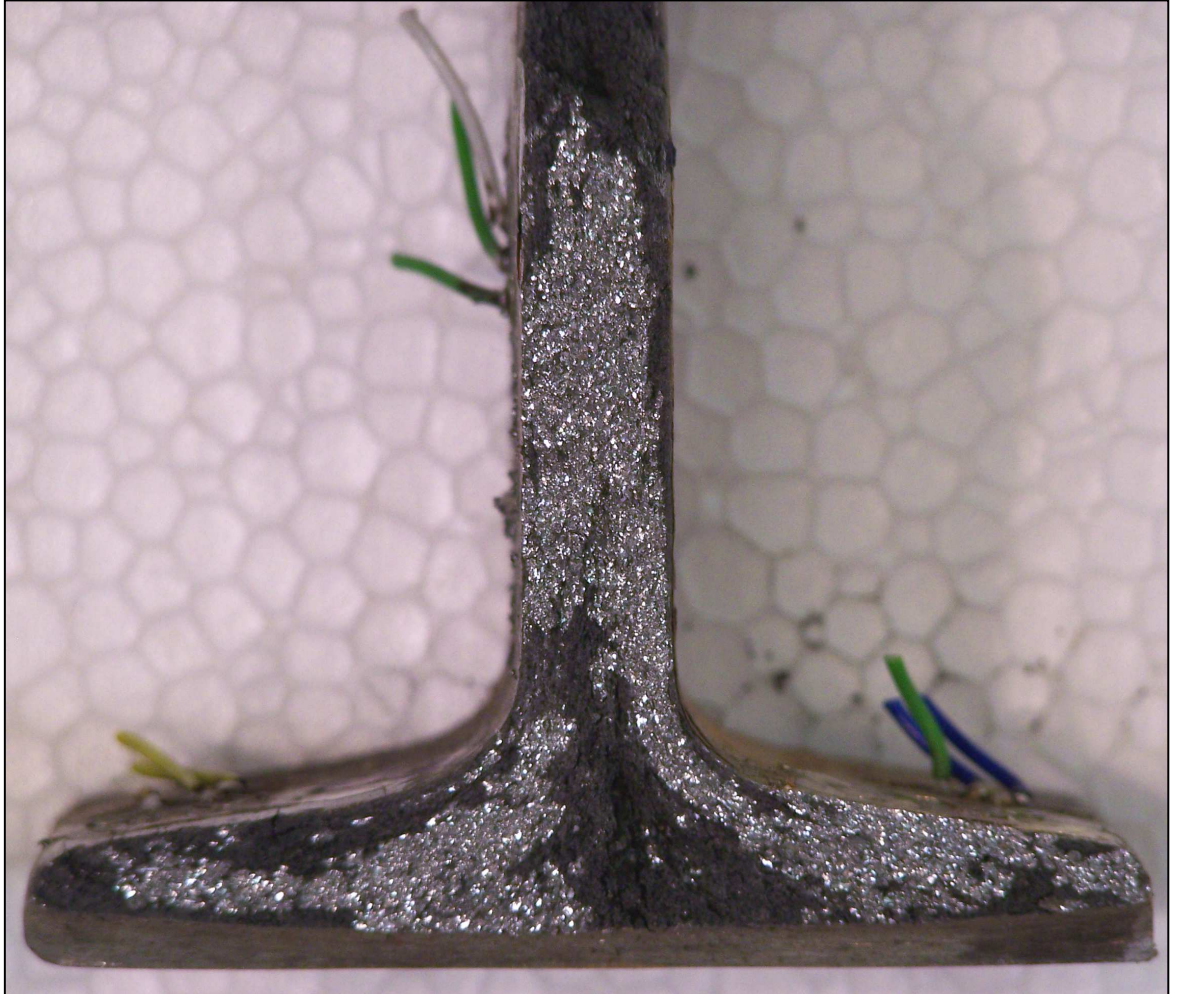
Fracture surface of beam at bottom flange area, with predominantly shiny and faceted appearance. The machined groove in the flange can also be seen at the bottom of the picture. (Photo by M.O'Sullivan 2008)
